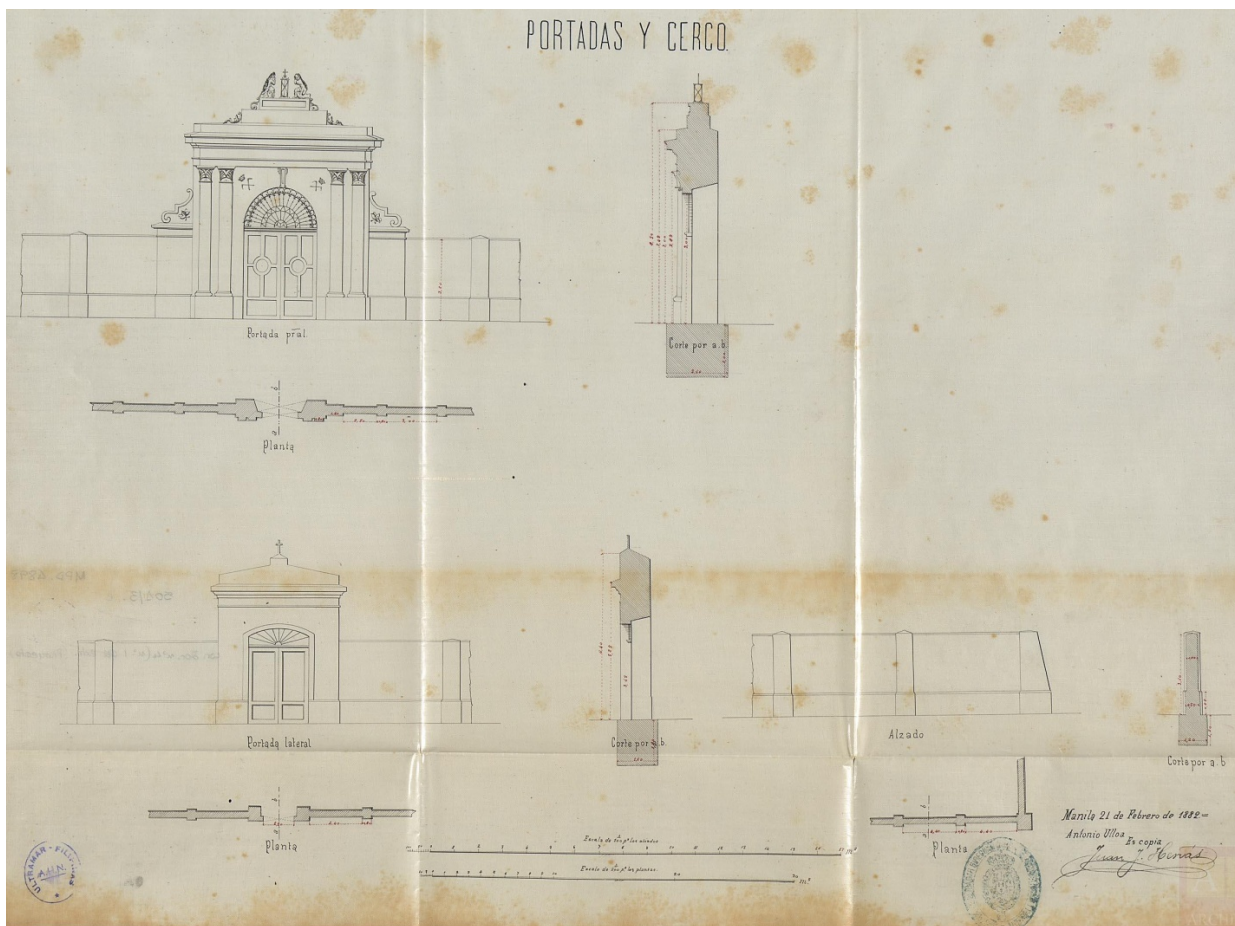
Plan for the construction of a new cemetery for Manila and its arrabales. Plan for the principal gate and fence, 1882.
